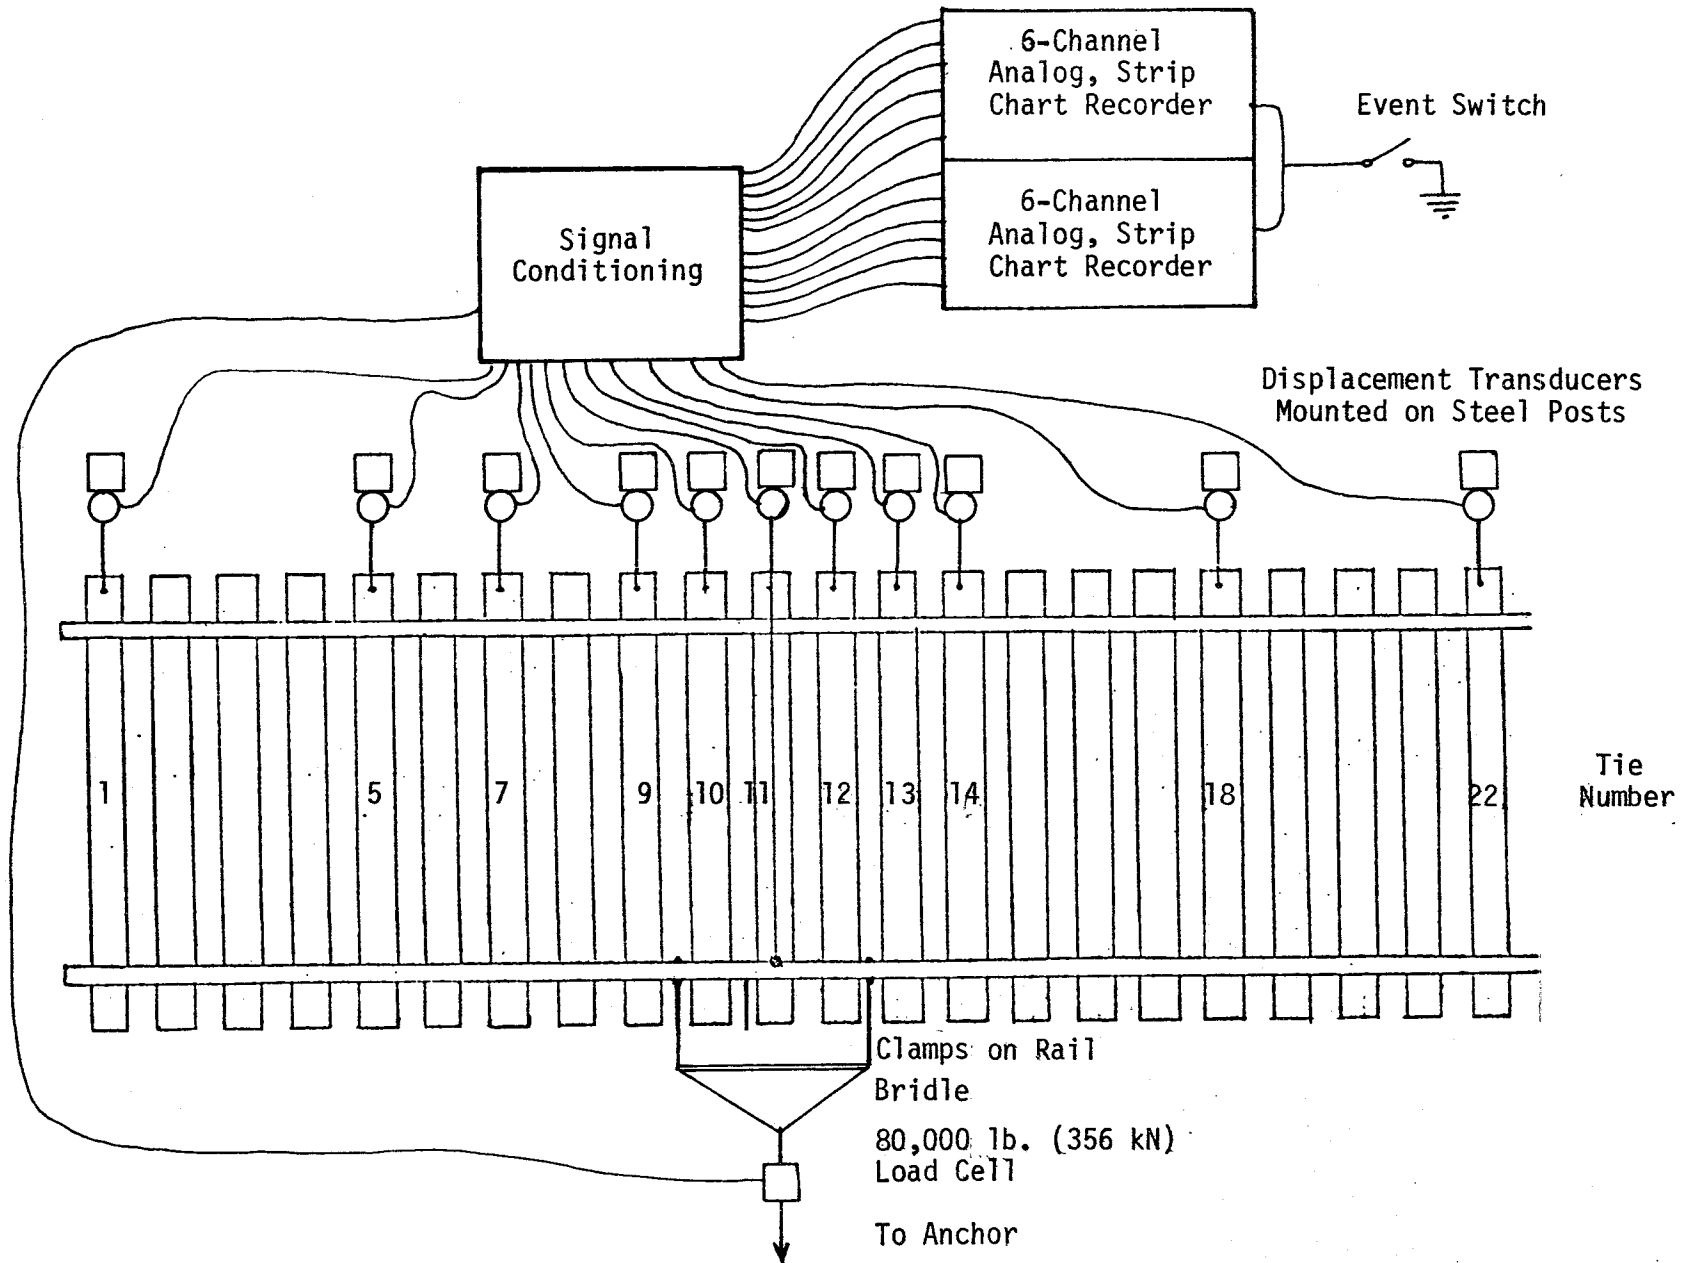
Arrangement of Instrumentation for Test on Panel A, West
